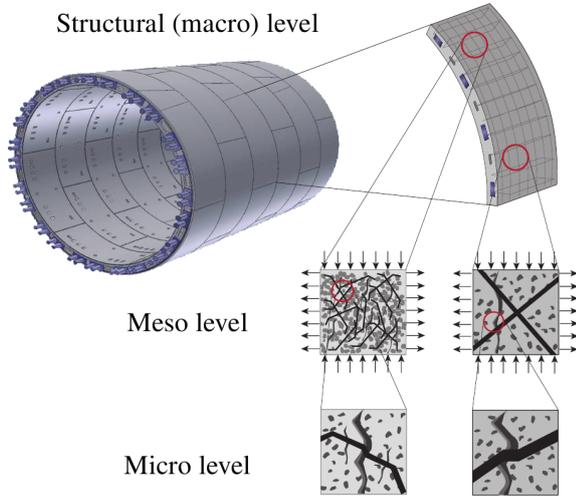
Multiscale oriented approach to the analyses of structures made of steel fiber reinforced concrete (in conjunction with conventional reinforced concrete).
